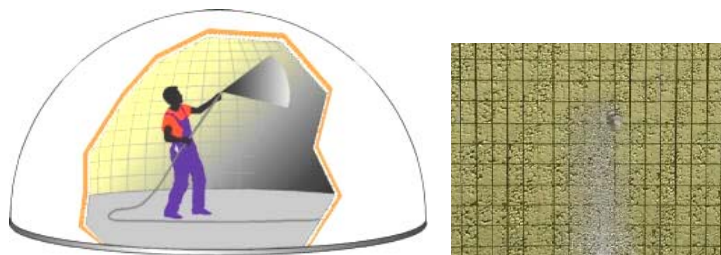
Building a Monolithic Dome. Step 5: Shotcrete layer. (Source: [14], [17])
